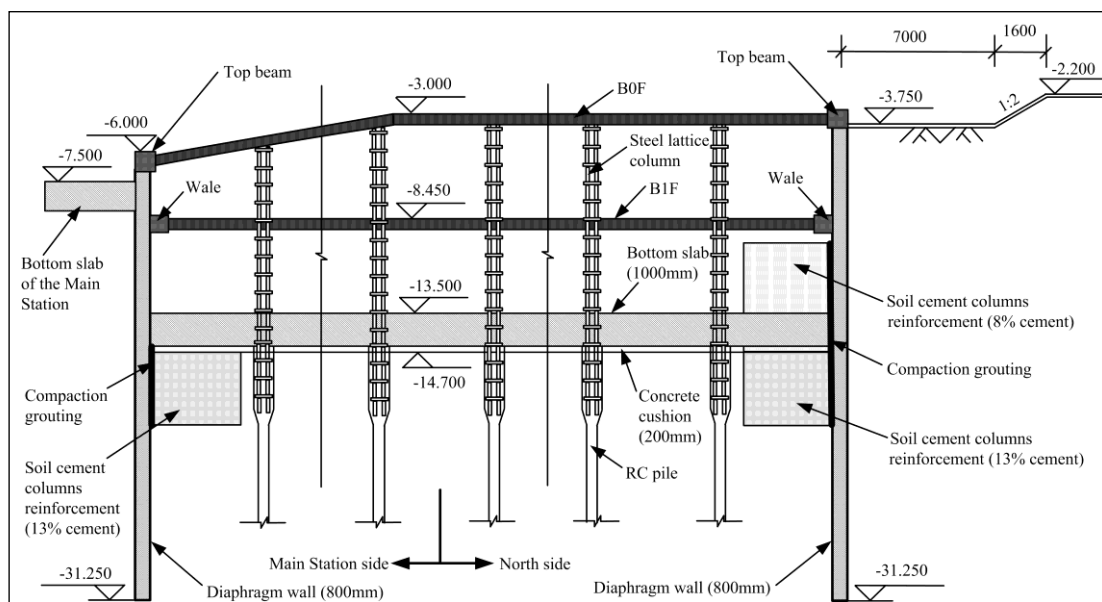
A-A cross section view of the North Square excavation (Xu 2007)
